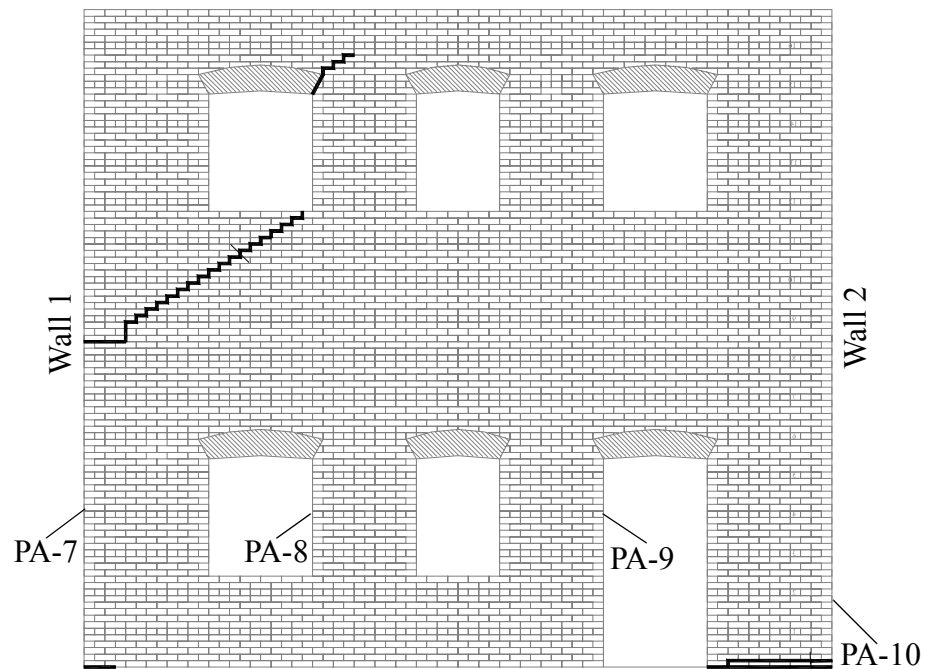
Crack pattern of Wall A following Test Run 10.
